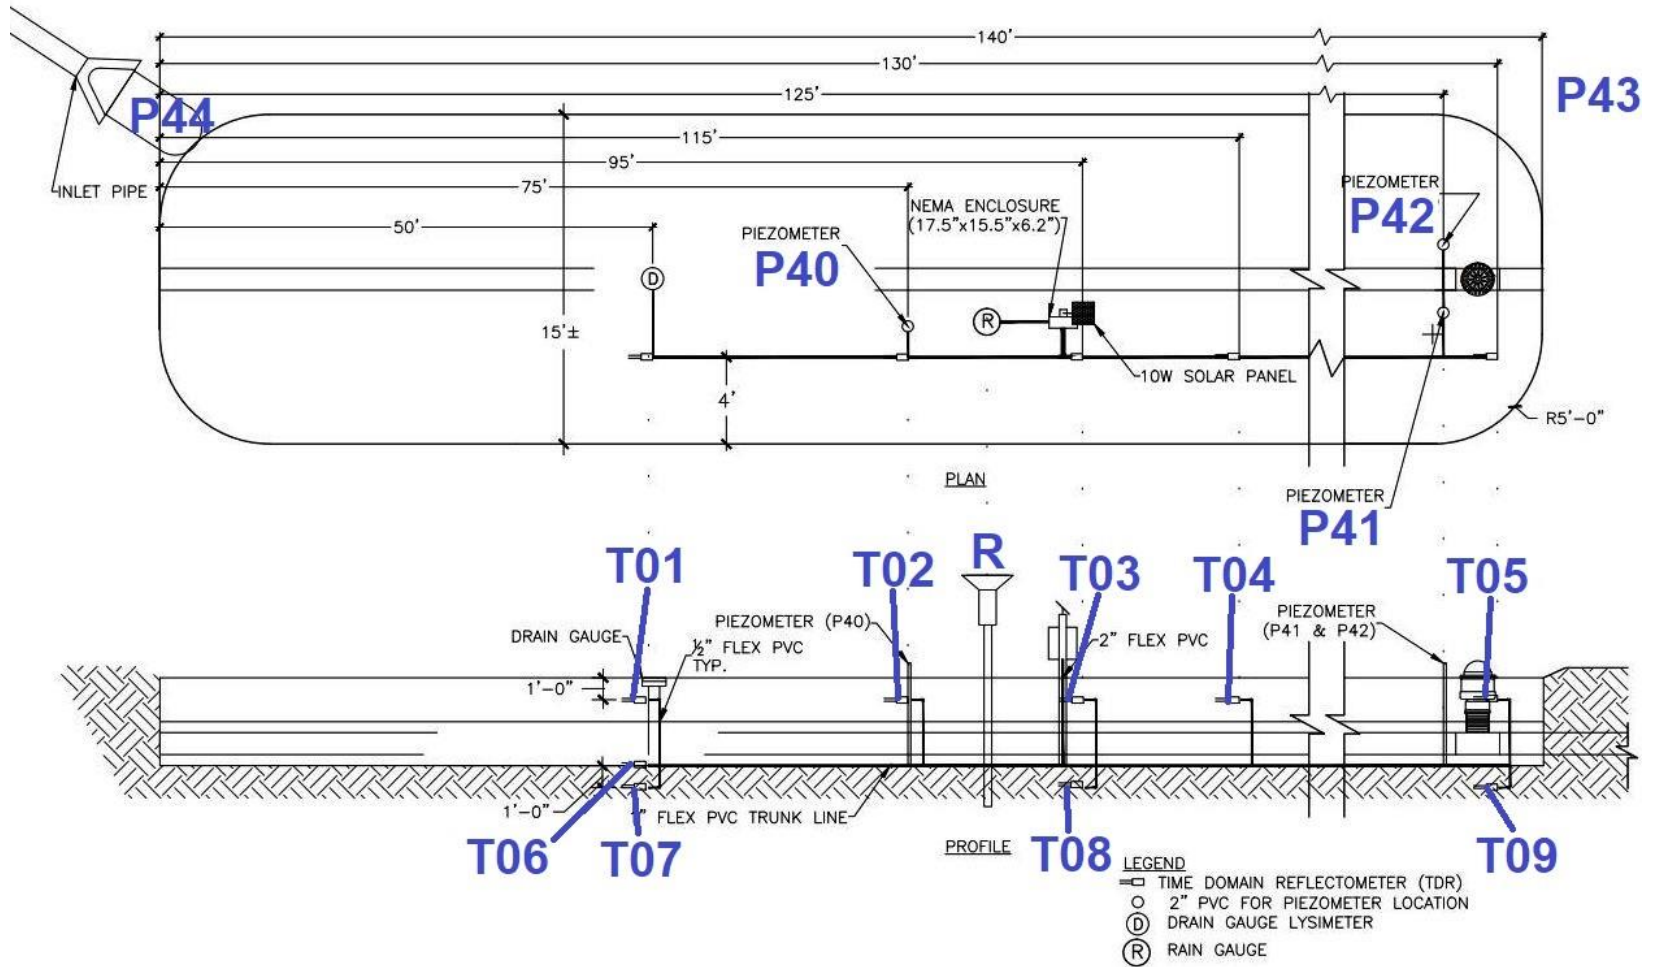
Horne St. bioretention system plans showing the plan and profile view with instrumentation (UNHSC, 2012b).
